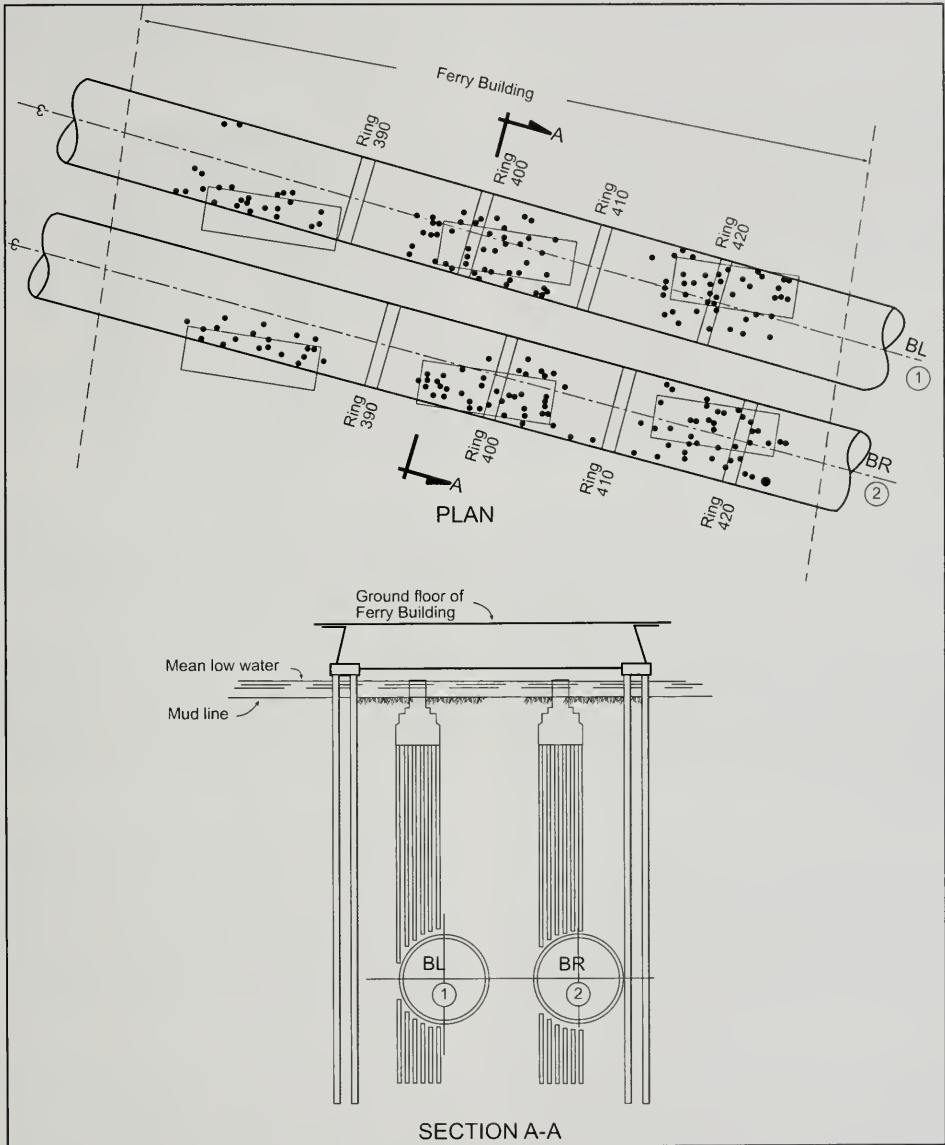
Tunneling conditions for BART beneath the S.F. Ferry Building and Embarcadero, taken from Kuesel (1972). The tunnel crowns were situated 50 feet beneath the base of the old pile cap foundations, shown as rectangles in the upper plan view. The Ferry Building was underpinned (long piles outboard of both tunnels), then the old piles were severed at the indicated positions (black dots).
